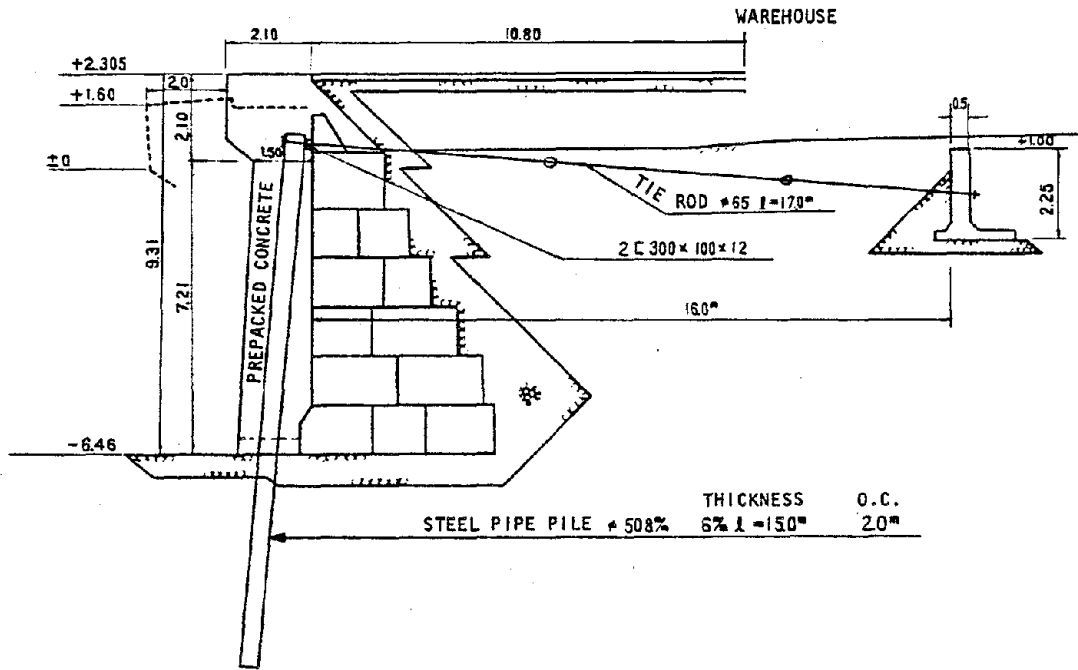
SOUTH QUAY WALL AT CENTRAL WHARF, NIIGATA PORT (JPHRI, 1964)
